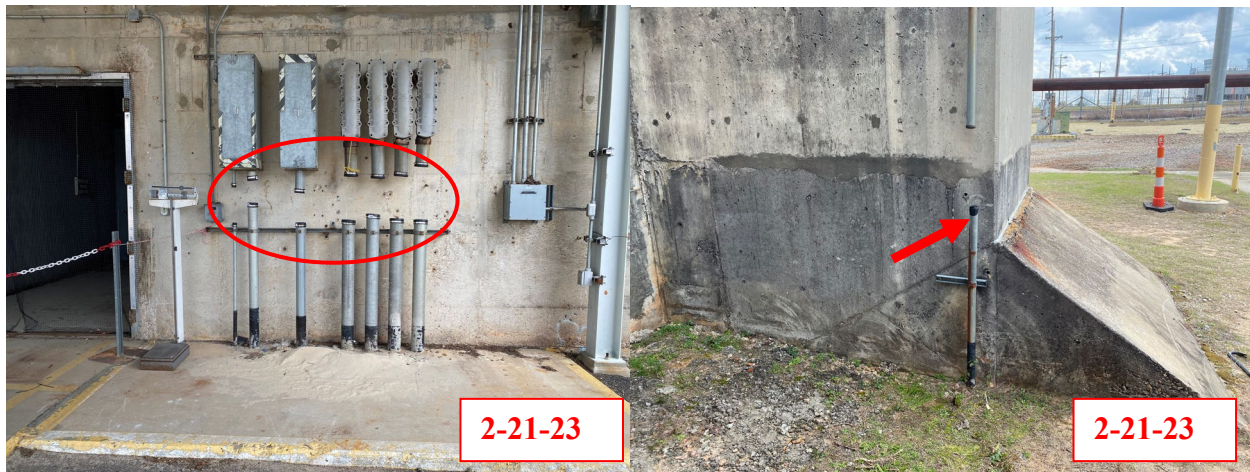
Air-Gapped Security Conduits, West Wall of 235-F
